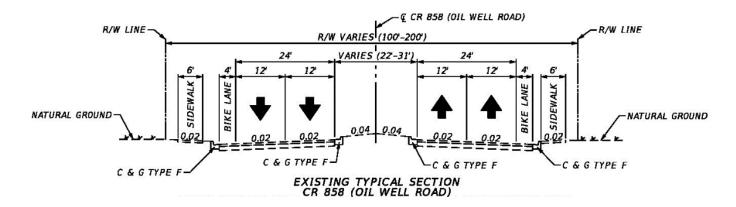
Existing 4-Lane Oil Well Road Typical Section
